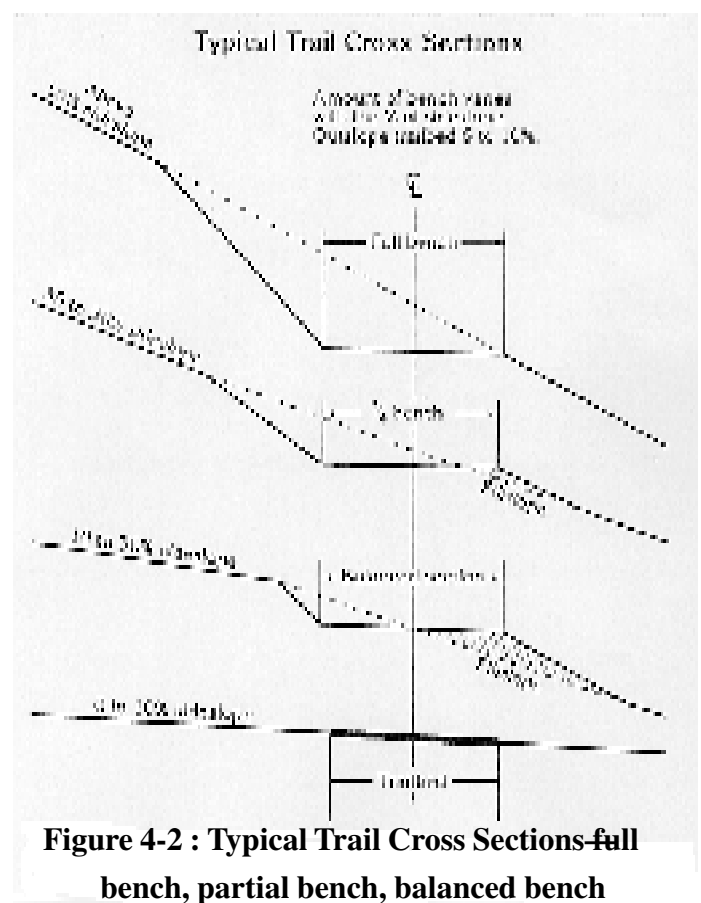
Typical Trail Cross Sections—full bench, partial bench, balanced bench
